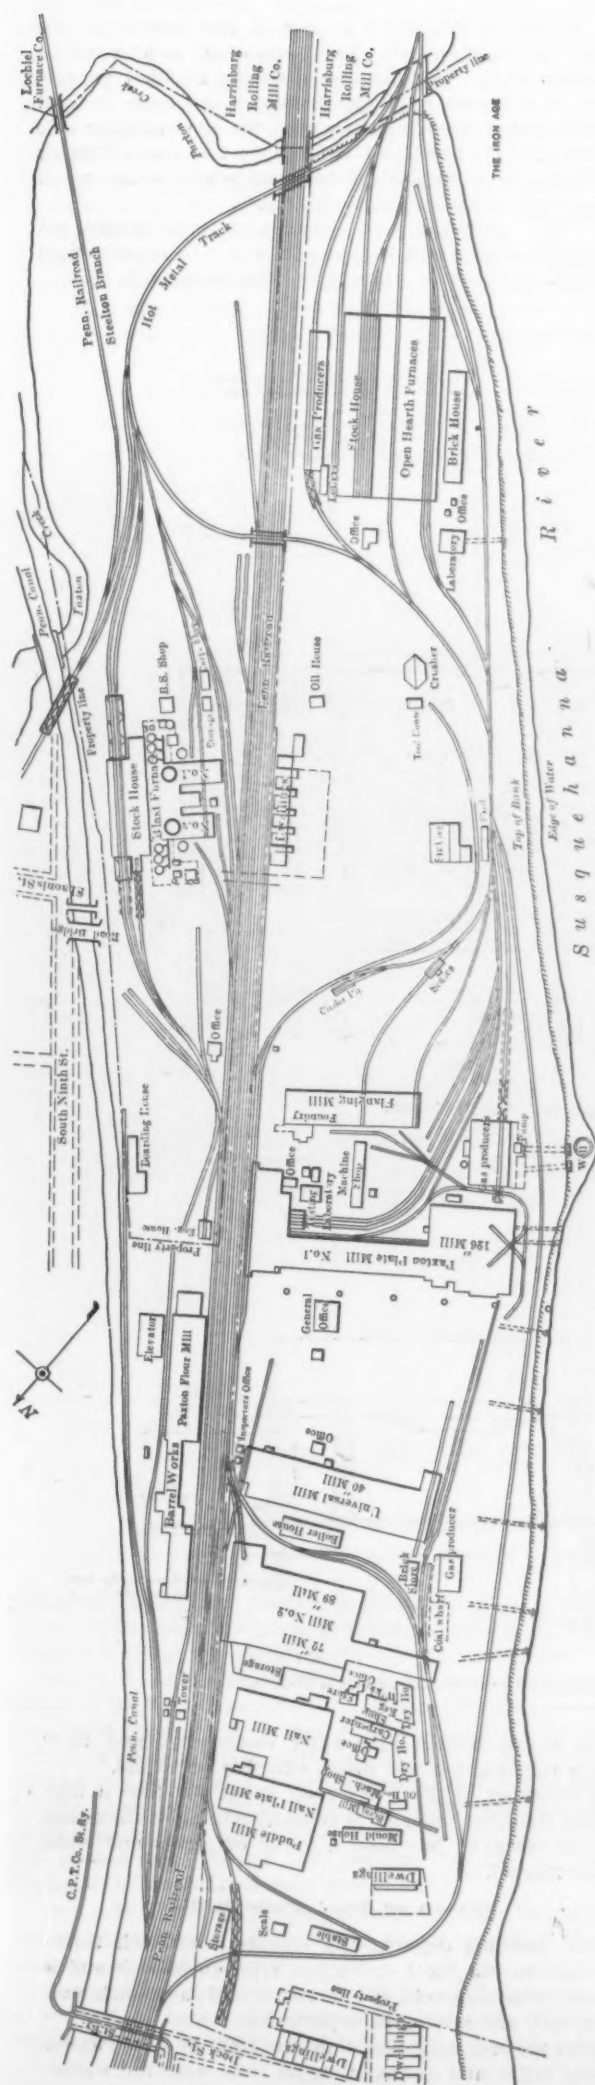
Plan View of the Central Iron & Steel Company's Plant at Harrisburg, Pa.
